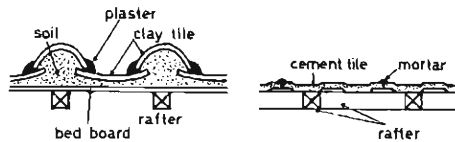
The structure of the tile roofing: clay-tile roofing (left). cement-tile roofing (right).
